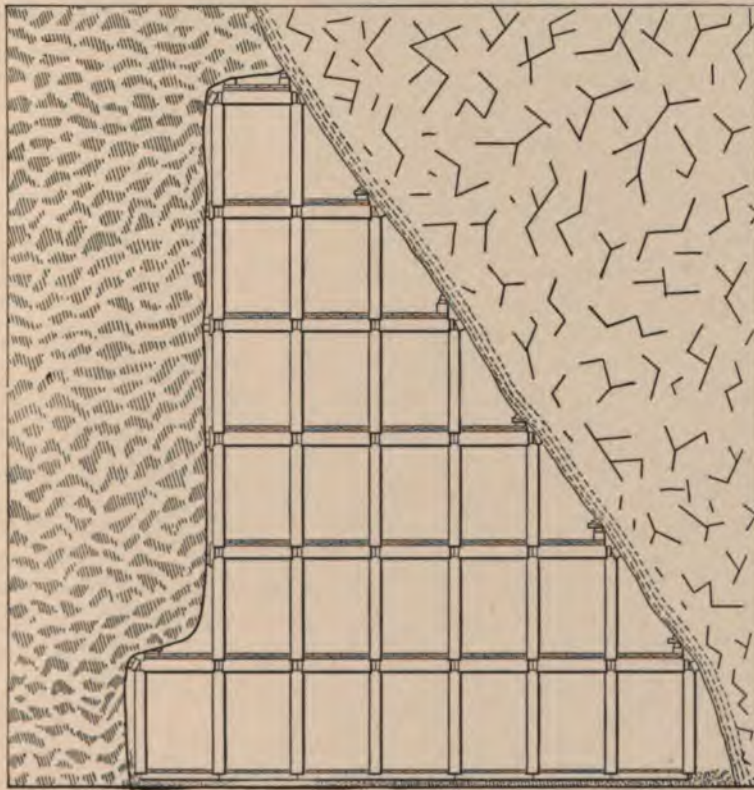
TRANSVERSE SECTION OF STOPE.
